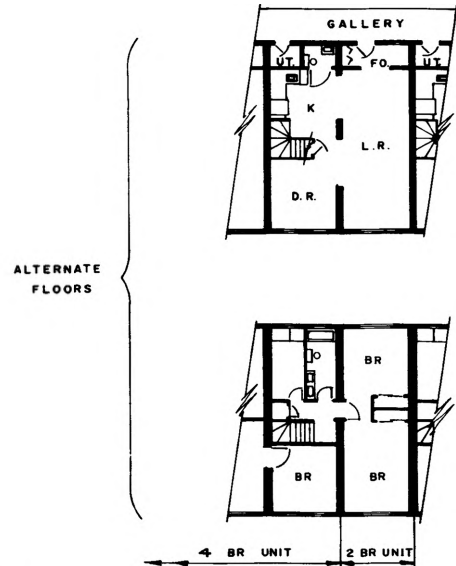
Floor plan of a duplex apartment with increased habitable area
